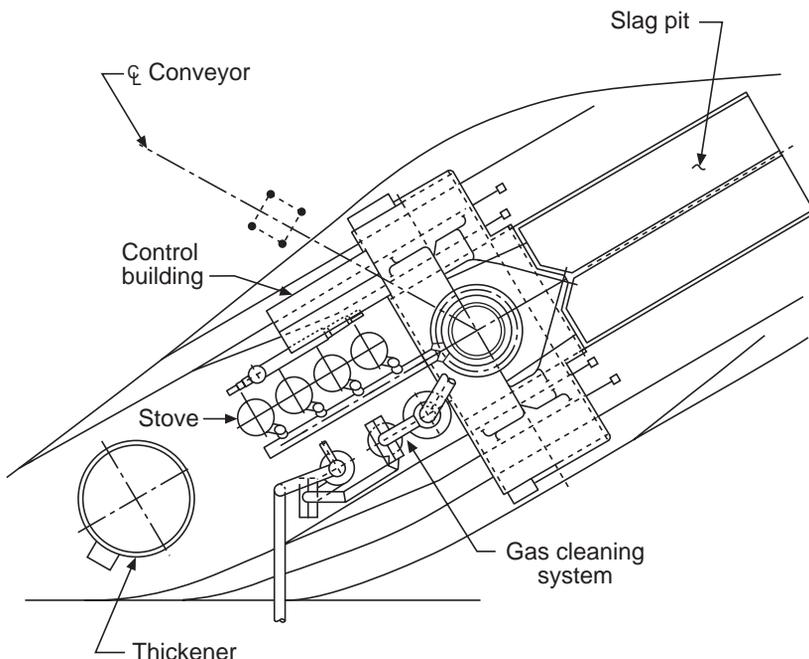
Layout of a casthouse arrangement with two tapholes.
